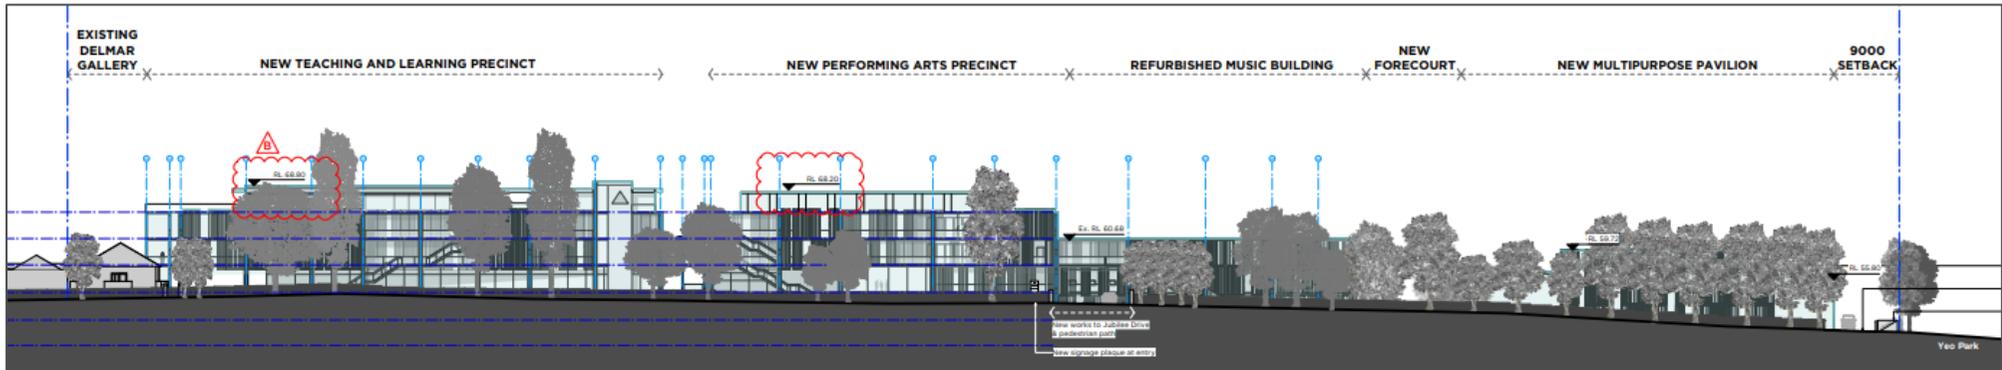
| Western elevation (Victoria Street) (Source: Applicant's SRtS 2021)
